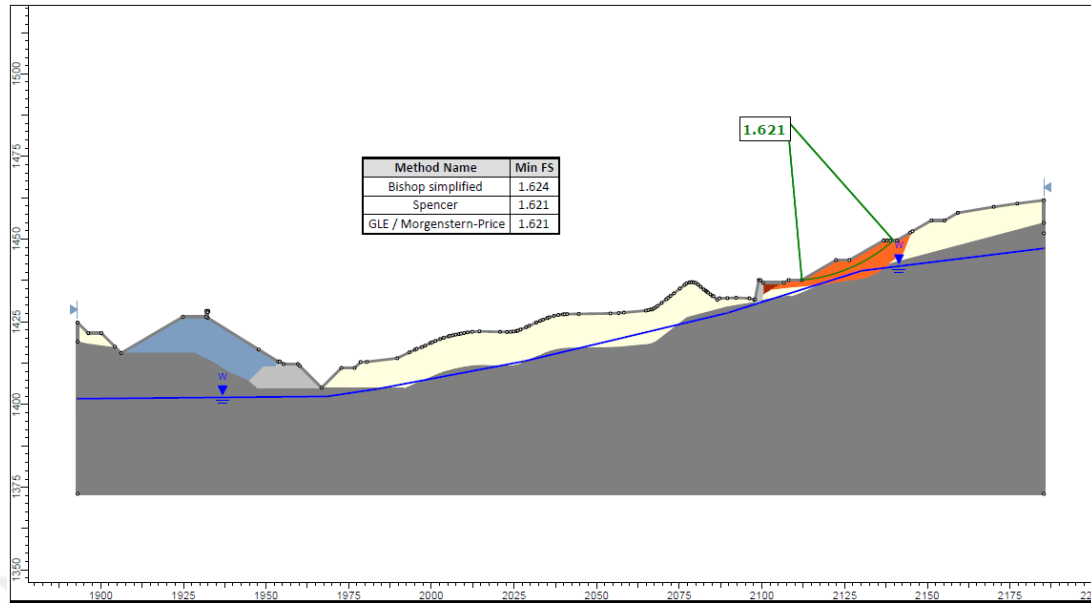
Final remedial design for Section B-B featuring a 30° slope with a stone masonry retaining wall under static conditions (FS=1.621)
